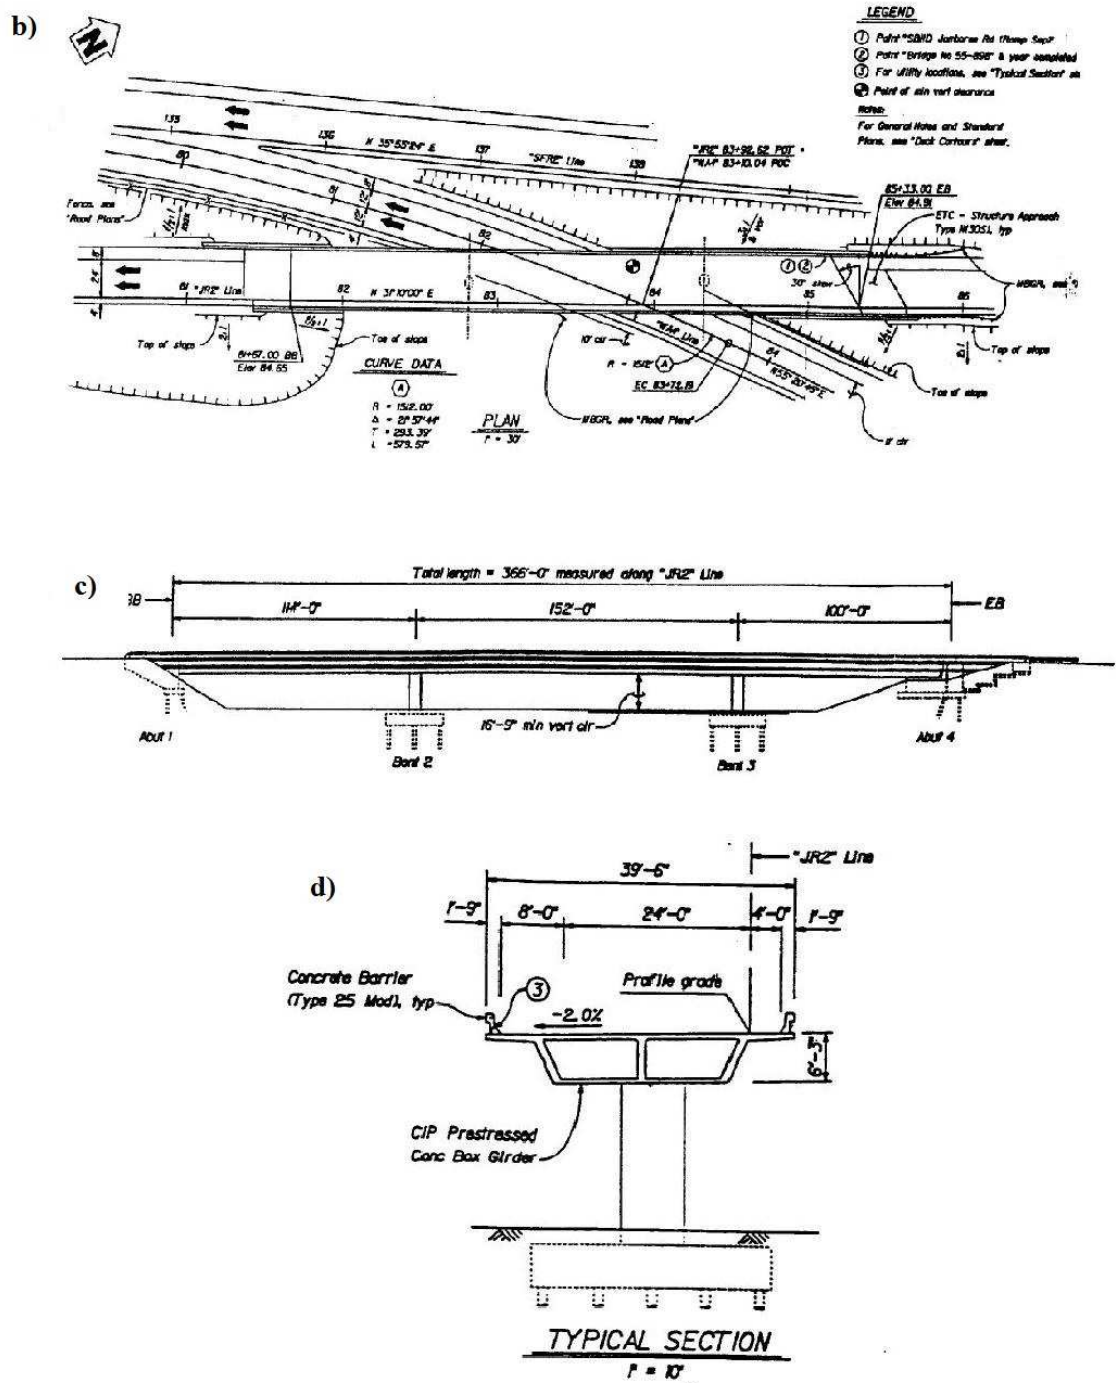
a) Jamboree Road Overcrossing located on Route 261; b) Plan; c) Elevation; d) Typical Cross Section Box-Girder
